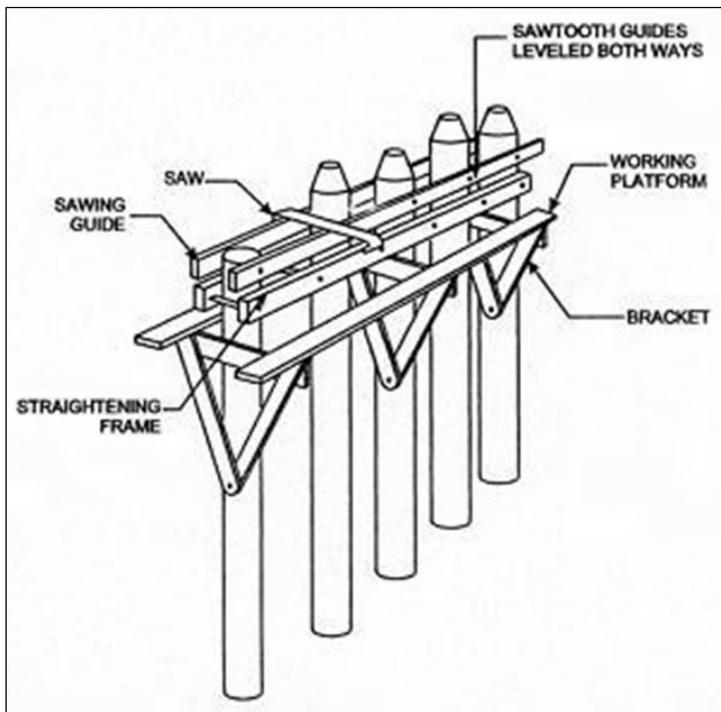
18: Using a Straightening Frame to Properly Align Timber Piles
